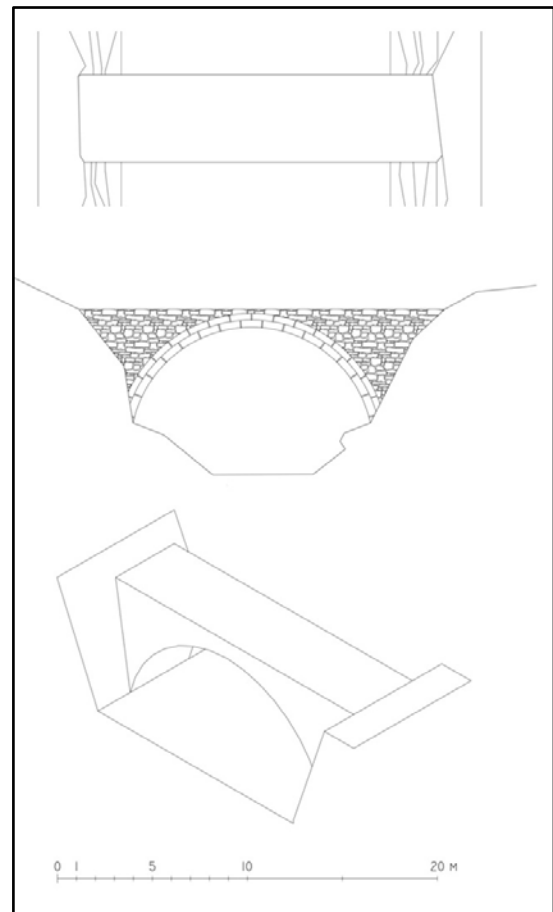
Plan, front elevation and axonometric view of Dušan's stone bridge
